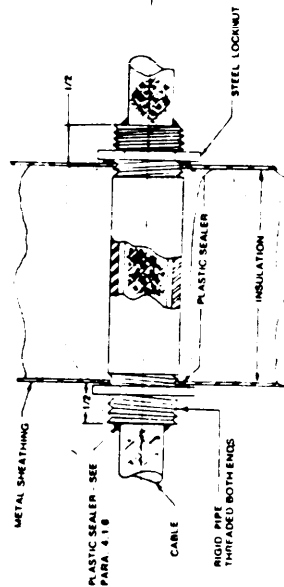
C-13. Stuffing tubes through refrigerated spaces.
